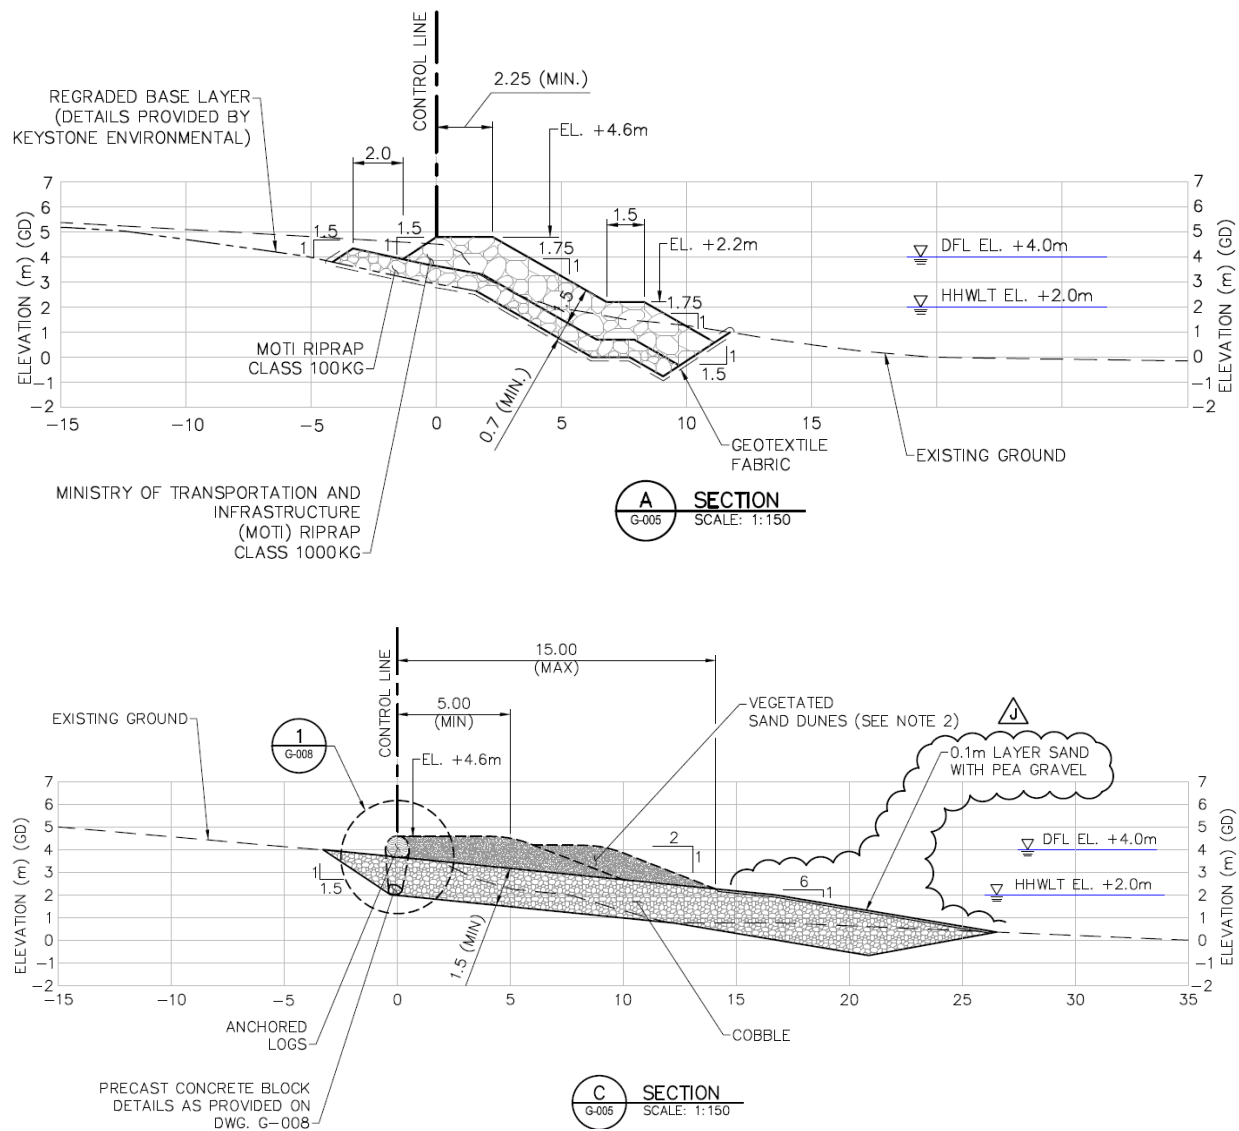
Example Cross-sections illustrating Rip Rap design (A) and Softshore design (C)
